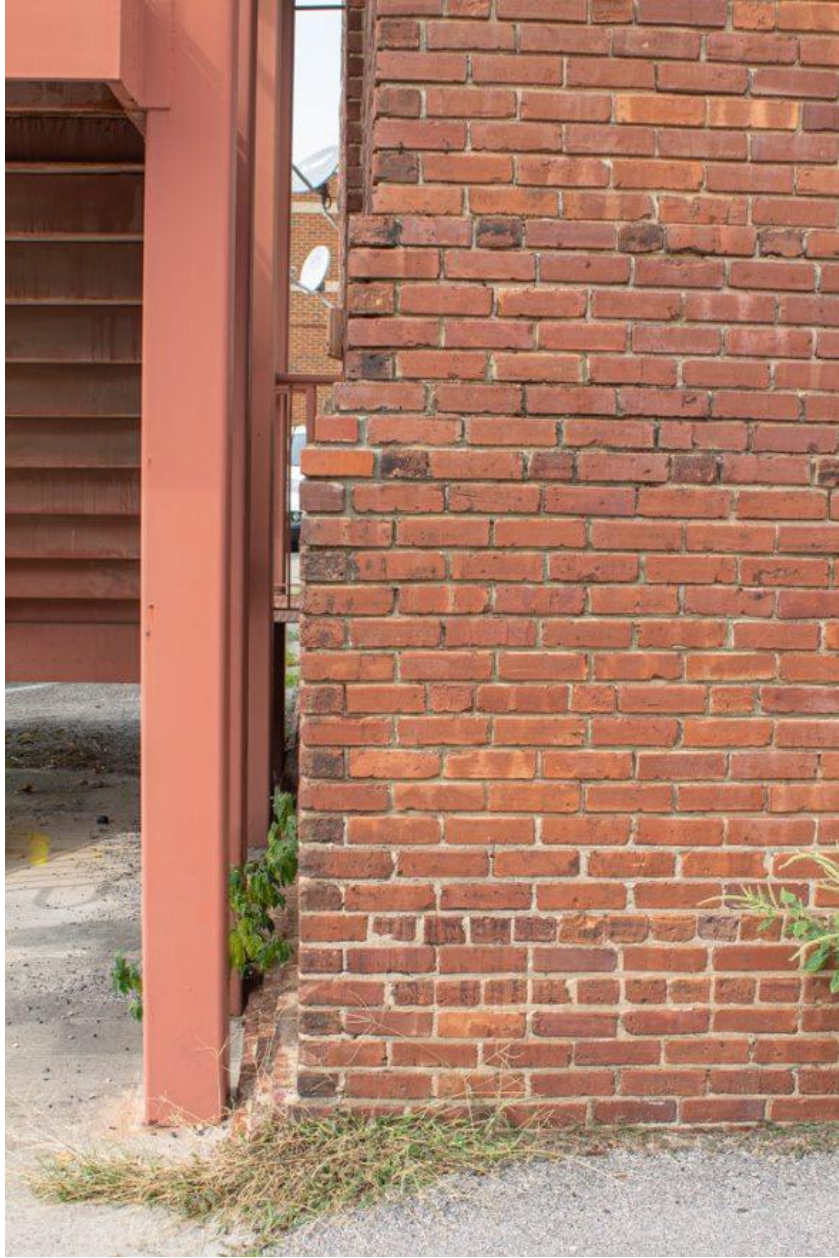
South elevation detail illustrating stepped water table resulting in a visually bold foundation.
